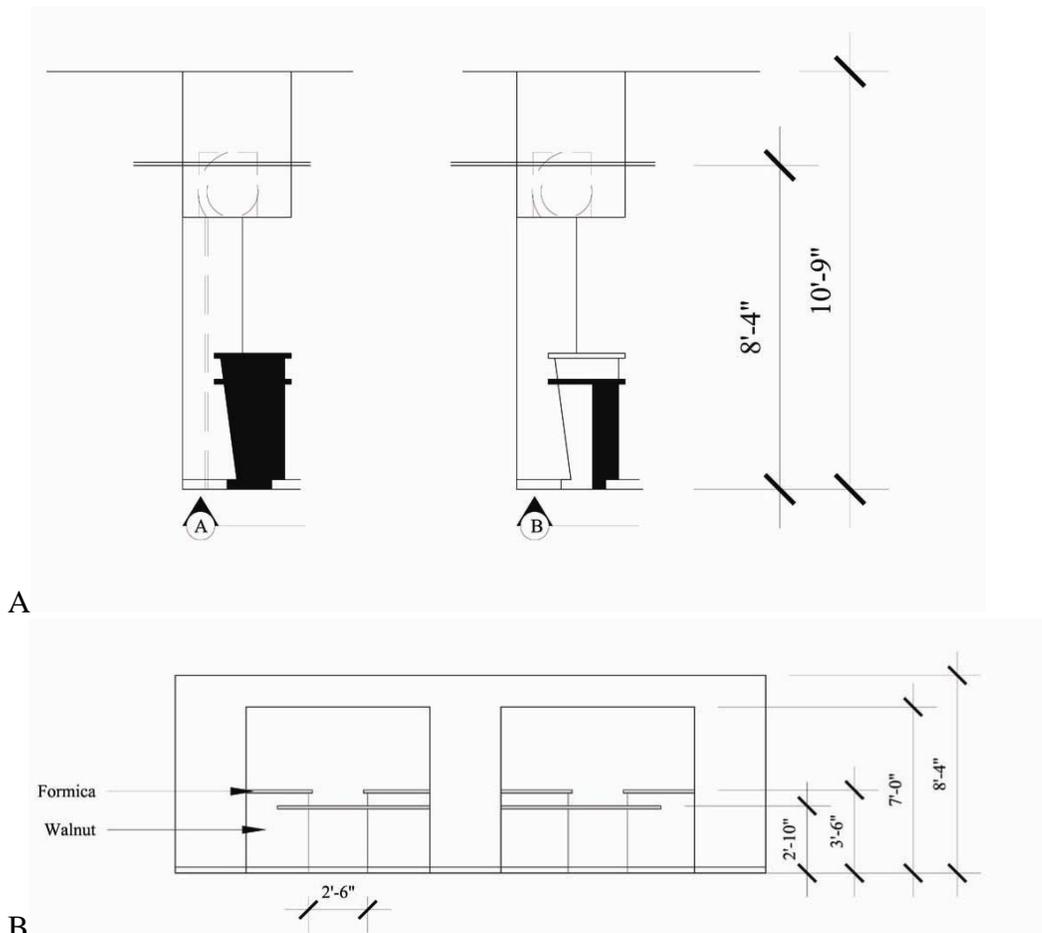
New Details of Control Desk (A) Sections, and (B) Elevation
